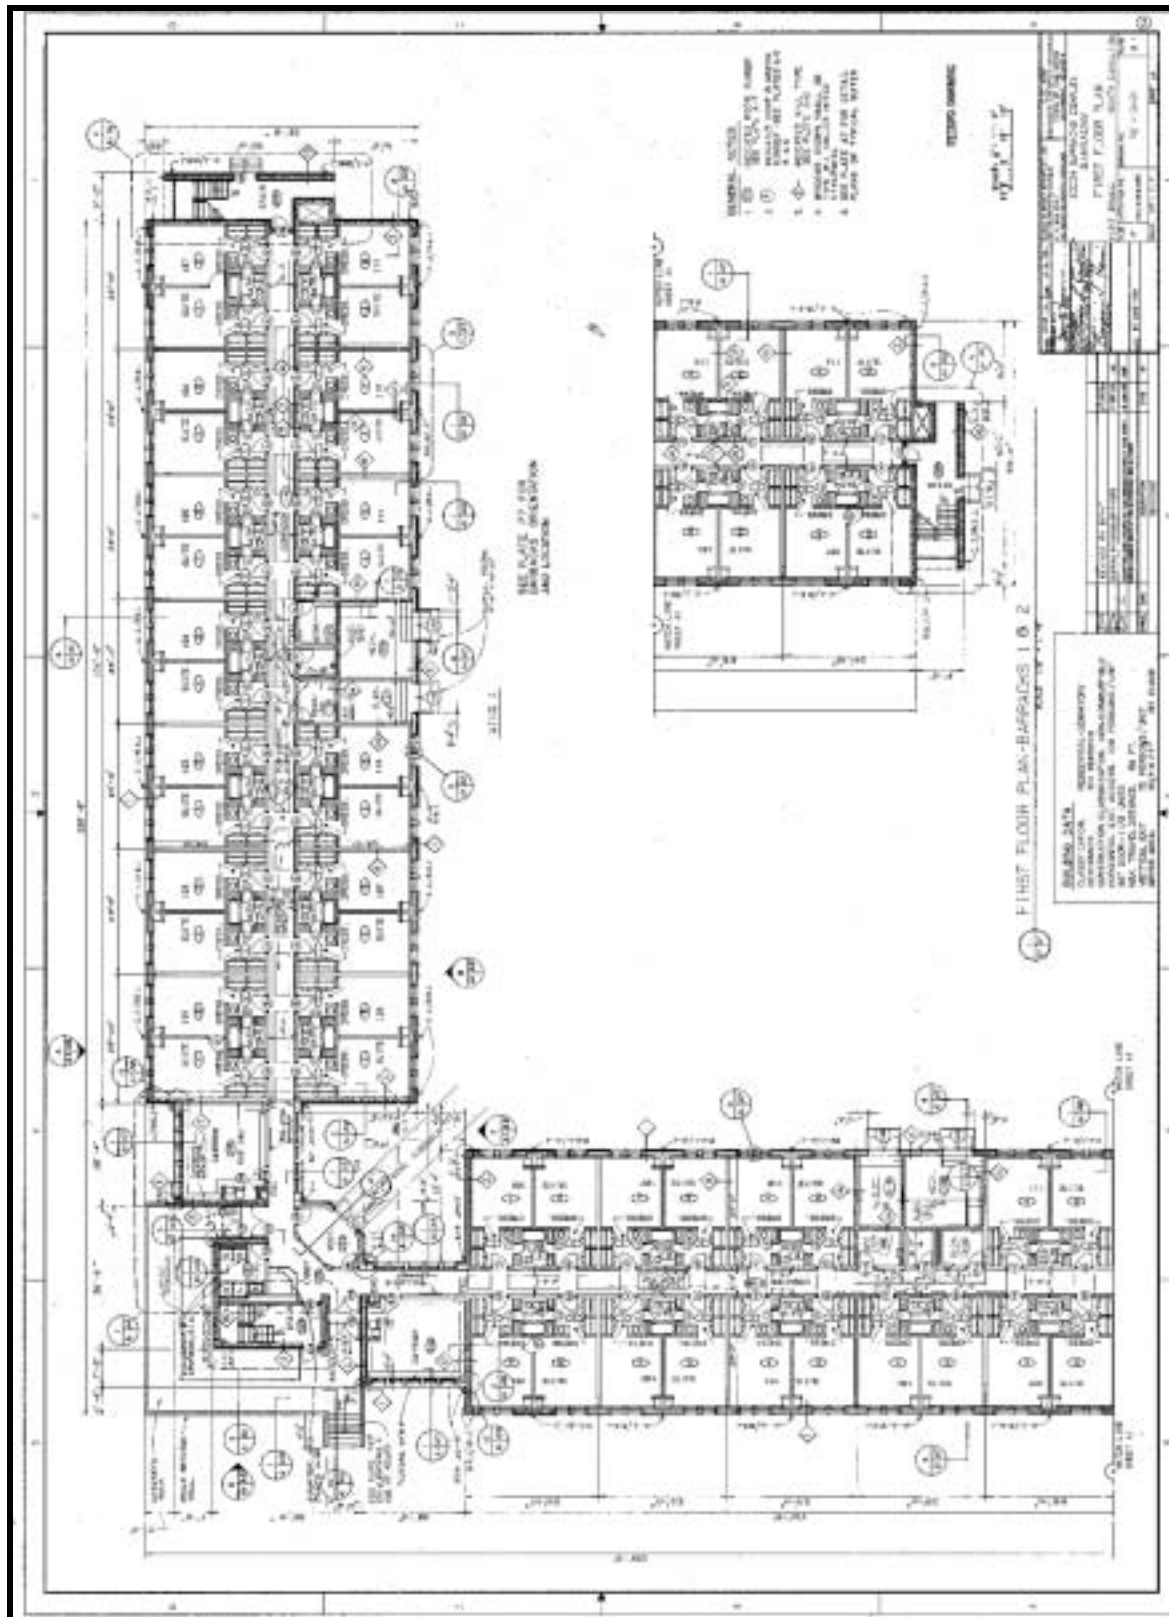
Double Quadrangle barracks, first floor plan, Ft. Bragg (1986, revised 1990) (Engineering, Ft. Bragg).
